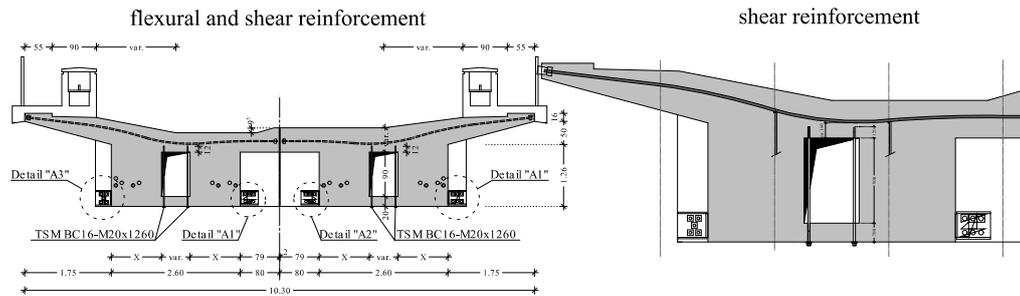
Additional flexural reinforcement on both sides of the hollow box girder and additional shear reinforcement drilled through the hollow box.
